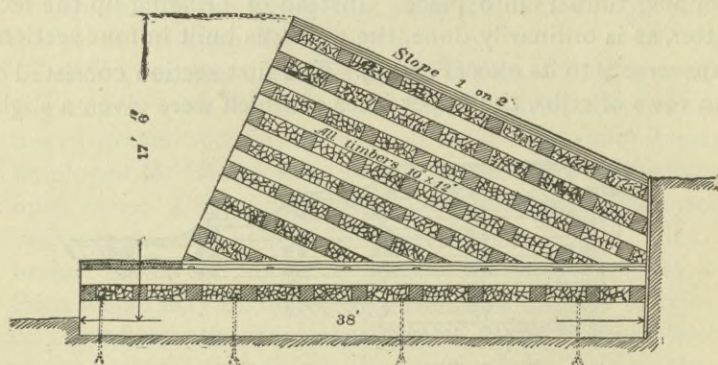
CROSS-SECTION OF BEAR RIVER WEIR.
